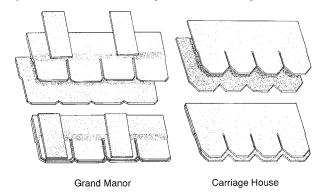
How shingle layers form a Super Heavy-Weight shingle.
